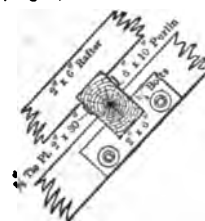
A. Purlin-connection. Purlins on Top of Truss-chord
